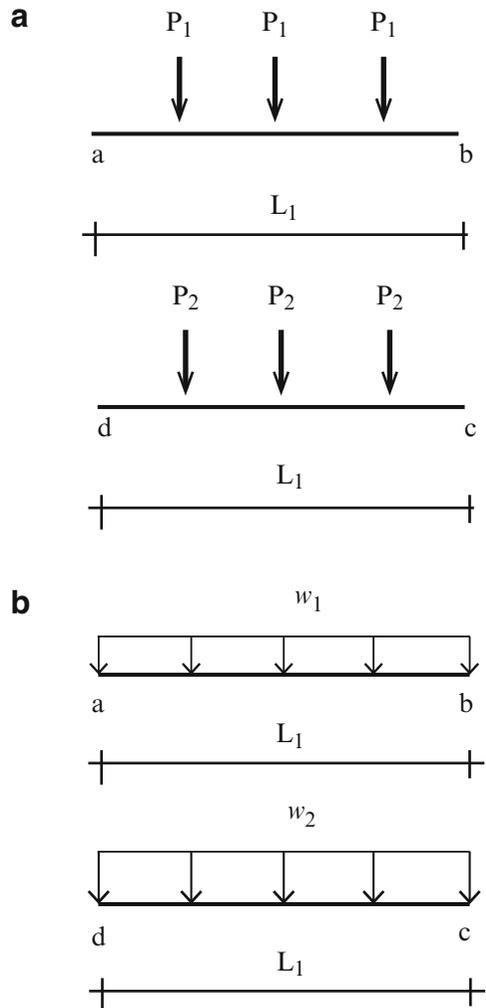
One-way action beam loading for uniform floor loading q . (a) Large joist spacing. (b) Small joist spacing
